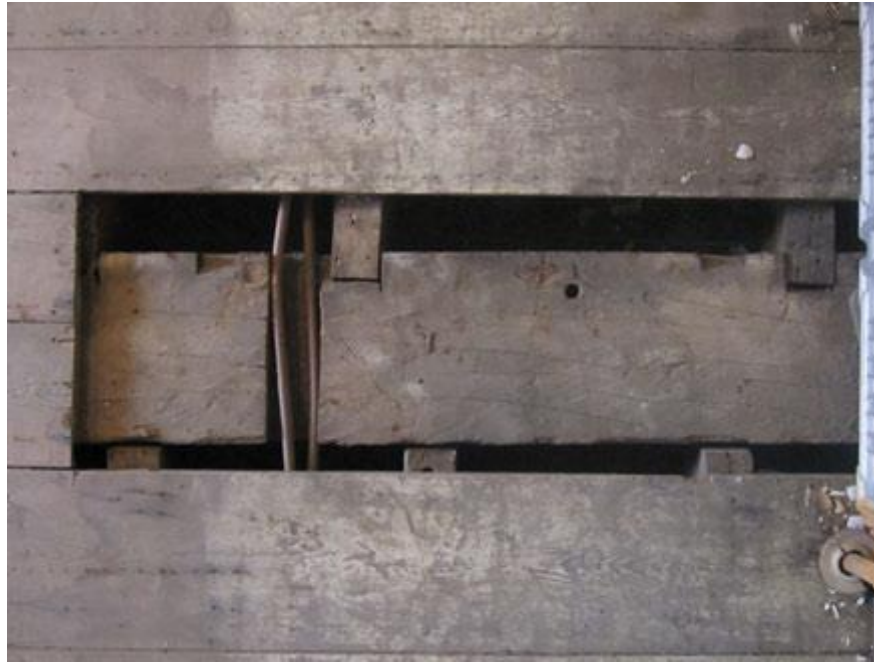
17th-century floor joists mortised into the chimney girt and summer beam (University of Pennsylvania, 2010).
